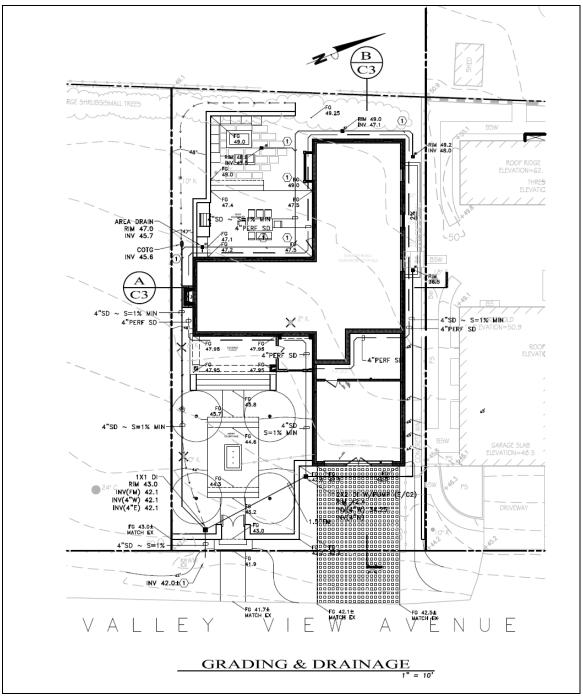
Grading and Drainage [830 cubic yards of grading are estimated for the implementation of the project as proposed. Excavation for the basement is expected to be to a depth of 15 feet].
